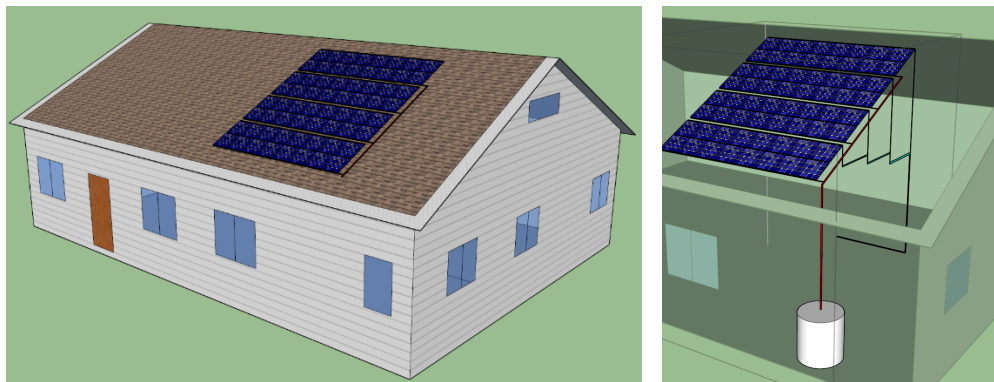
Plan of BIPVT panels on roof top, 25m² out of 125m²
